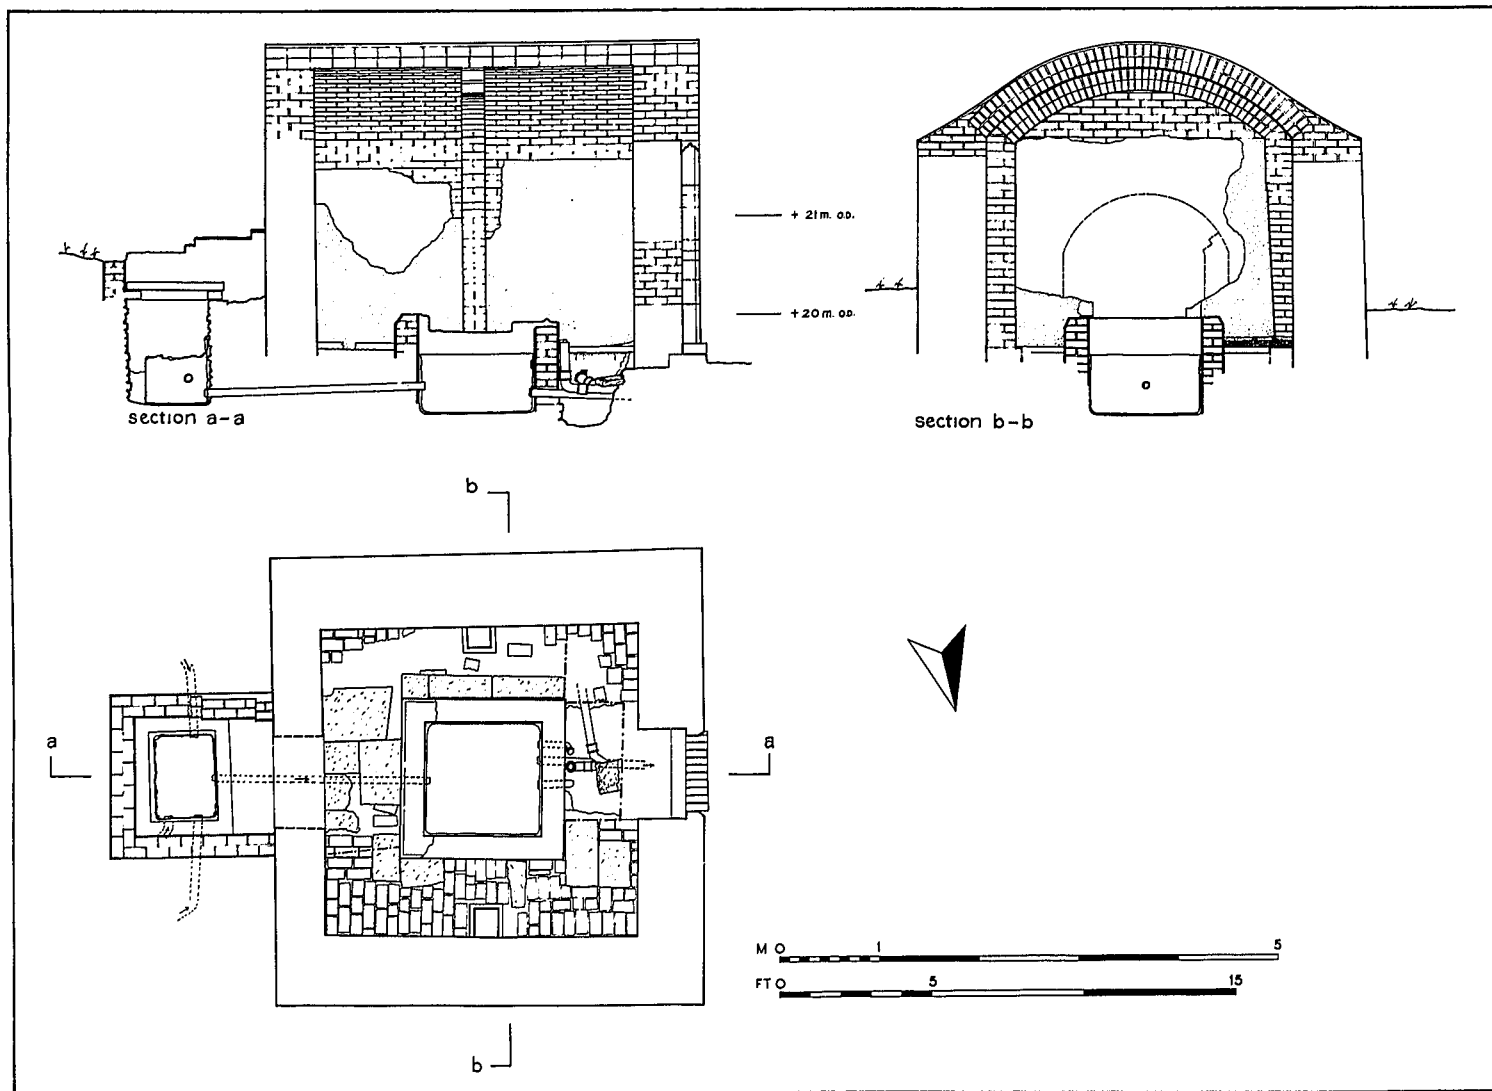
Plan and Elevations of Conduit House, Military Road, Canterbury.
